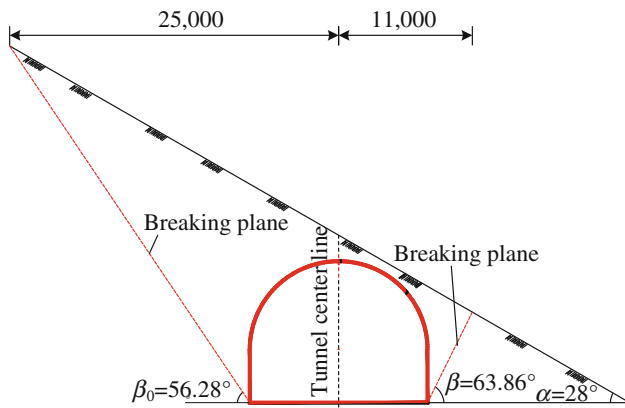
Slide plane of the surrounding rock (unit: mm)
